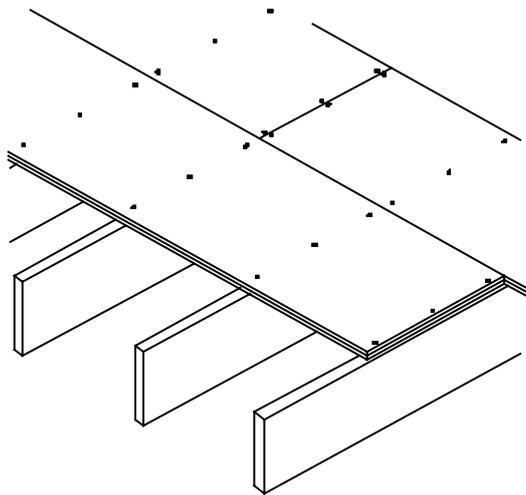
Tongued and grooved edge structural decking should be laid across the joists with short edges supported on joists
